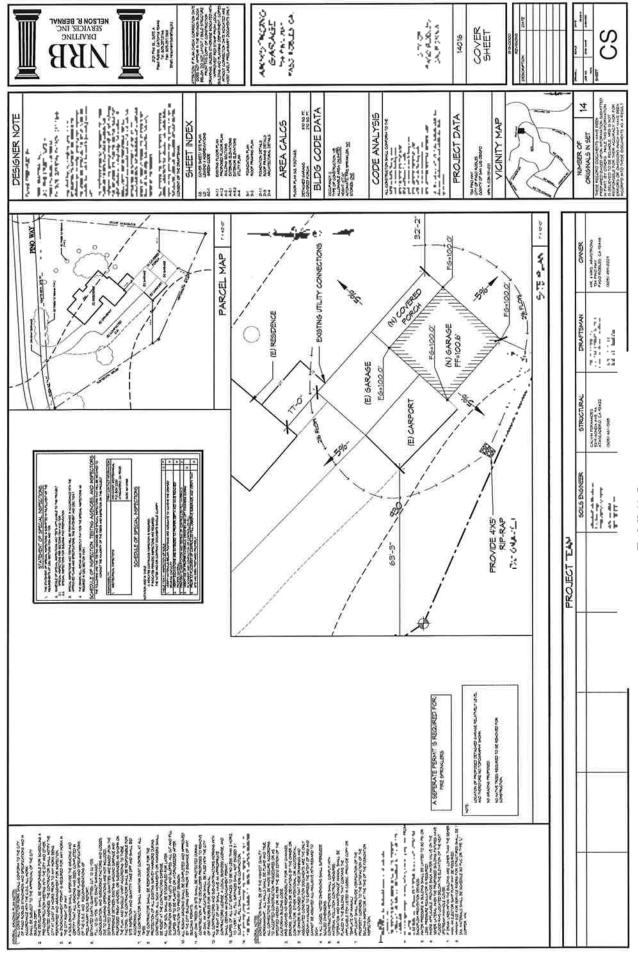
Exhibit A Site Plan CUP 14:004 (Armsfrong)
